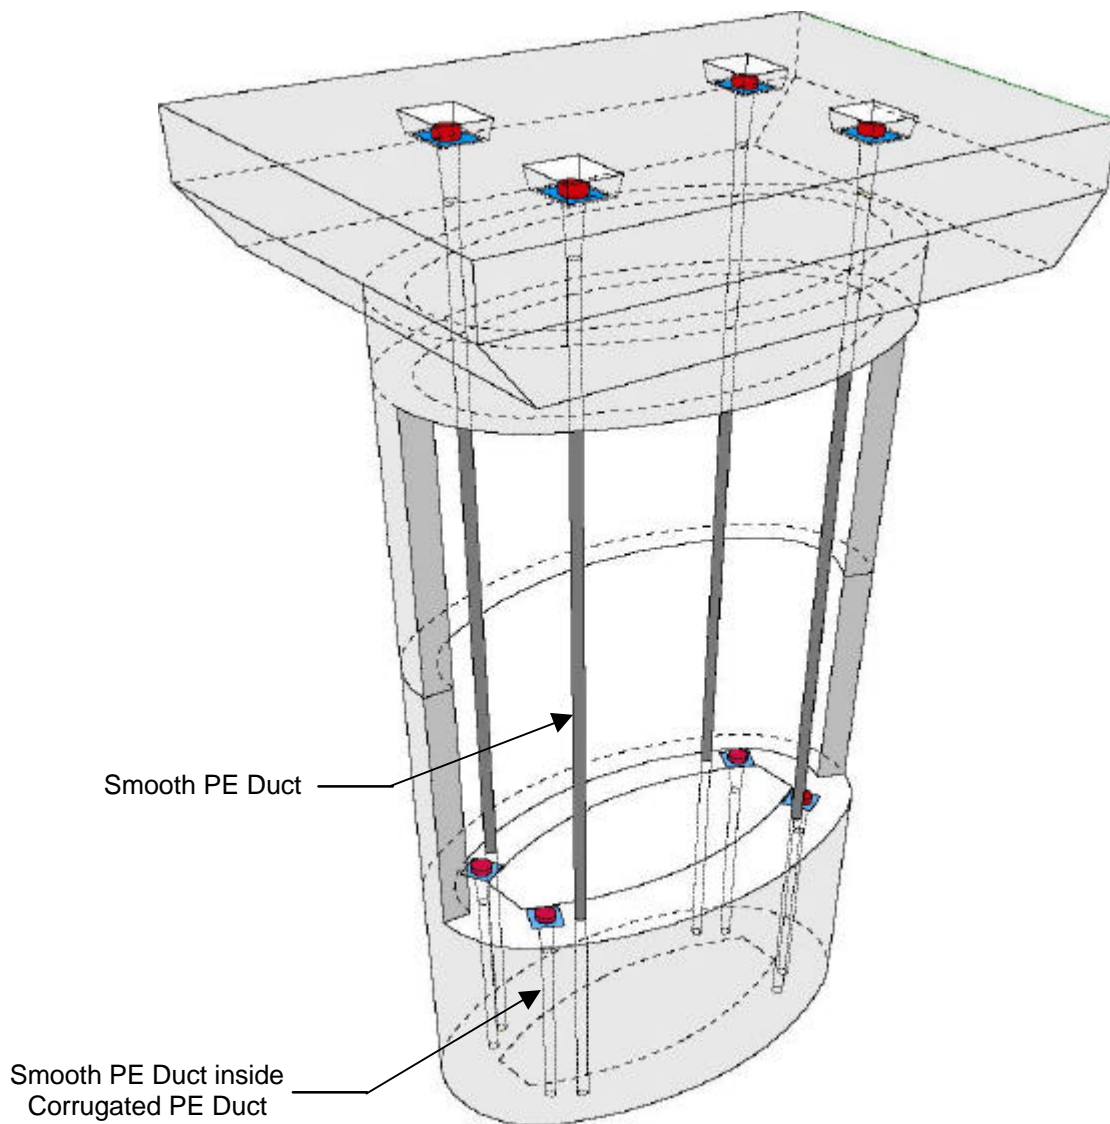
Vertical Post-Tensioning of the High Level Approach Piers of the Sunshine Skyway Bridge
